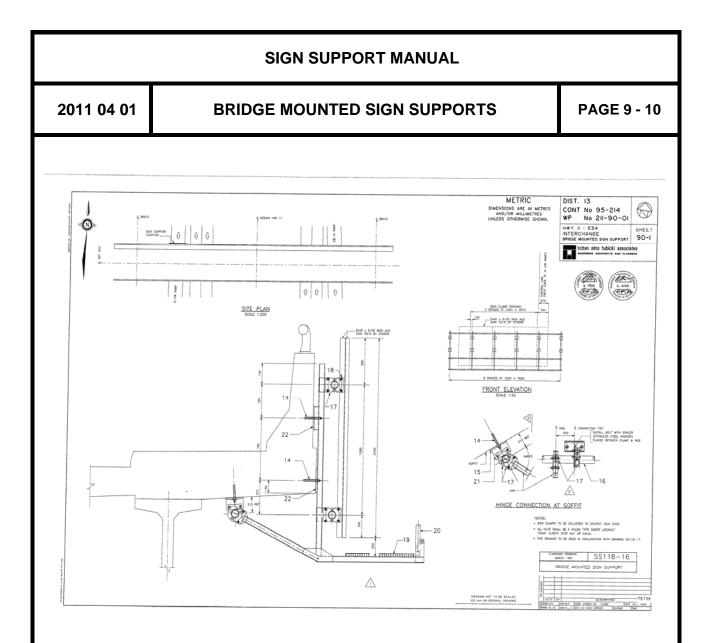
(a) GENERAL LAYOUT DRAWING
